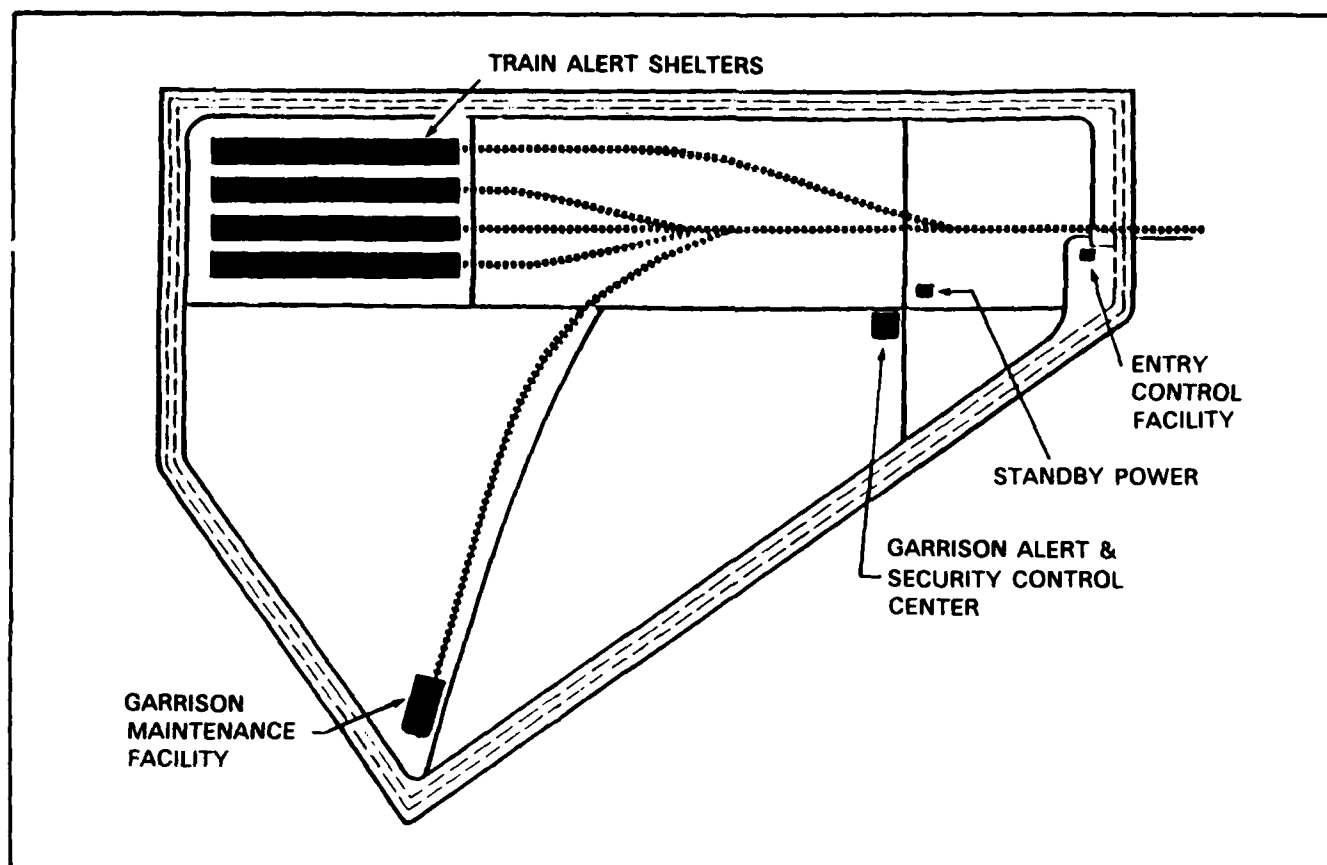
TYPICAL RAIL GARRISON FACILITY LAYOUT
